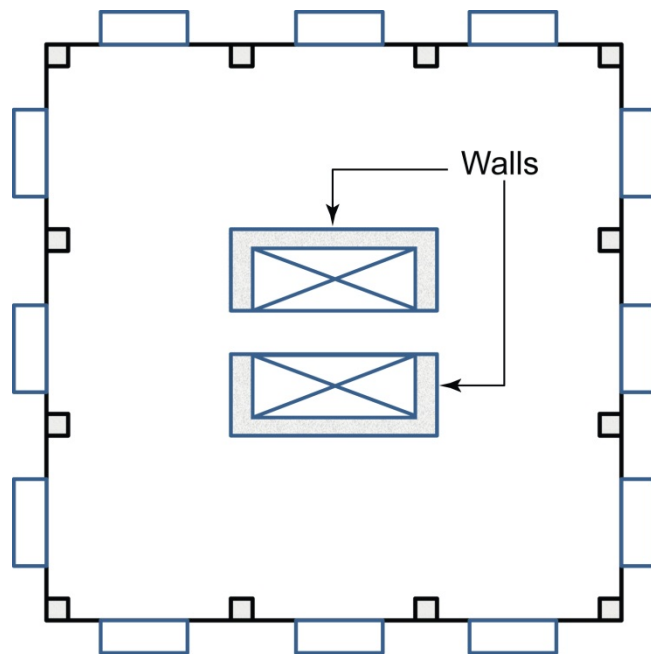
Typical floor plan of high-rise residential construction in the United States.
